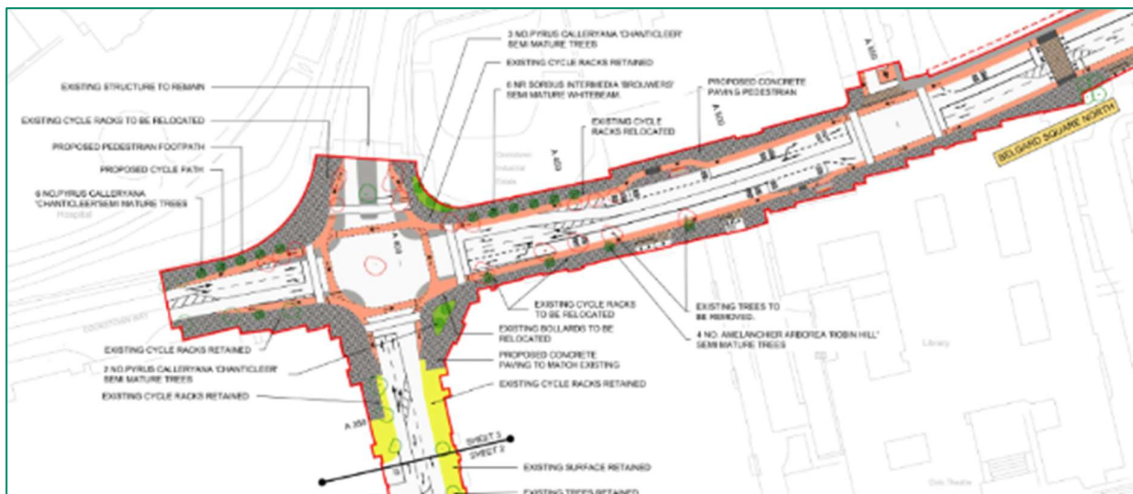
Extract of Landscape General Arrangement Drawings Belgard Square North
